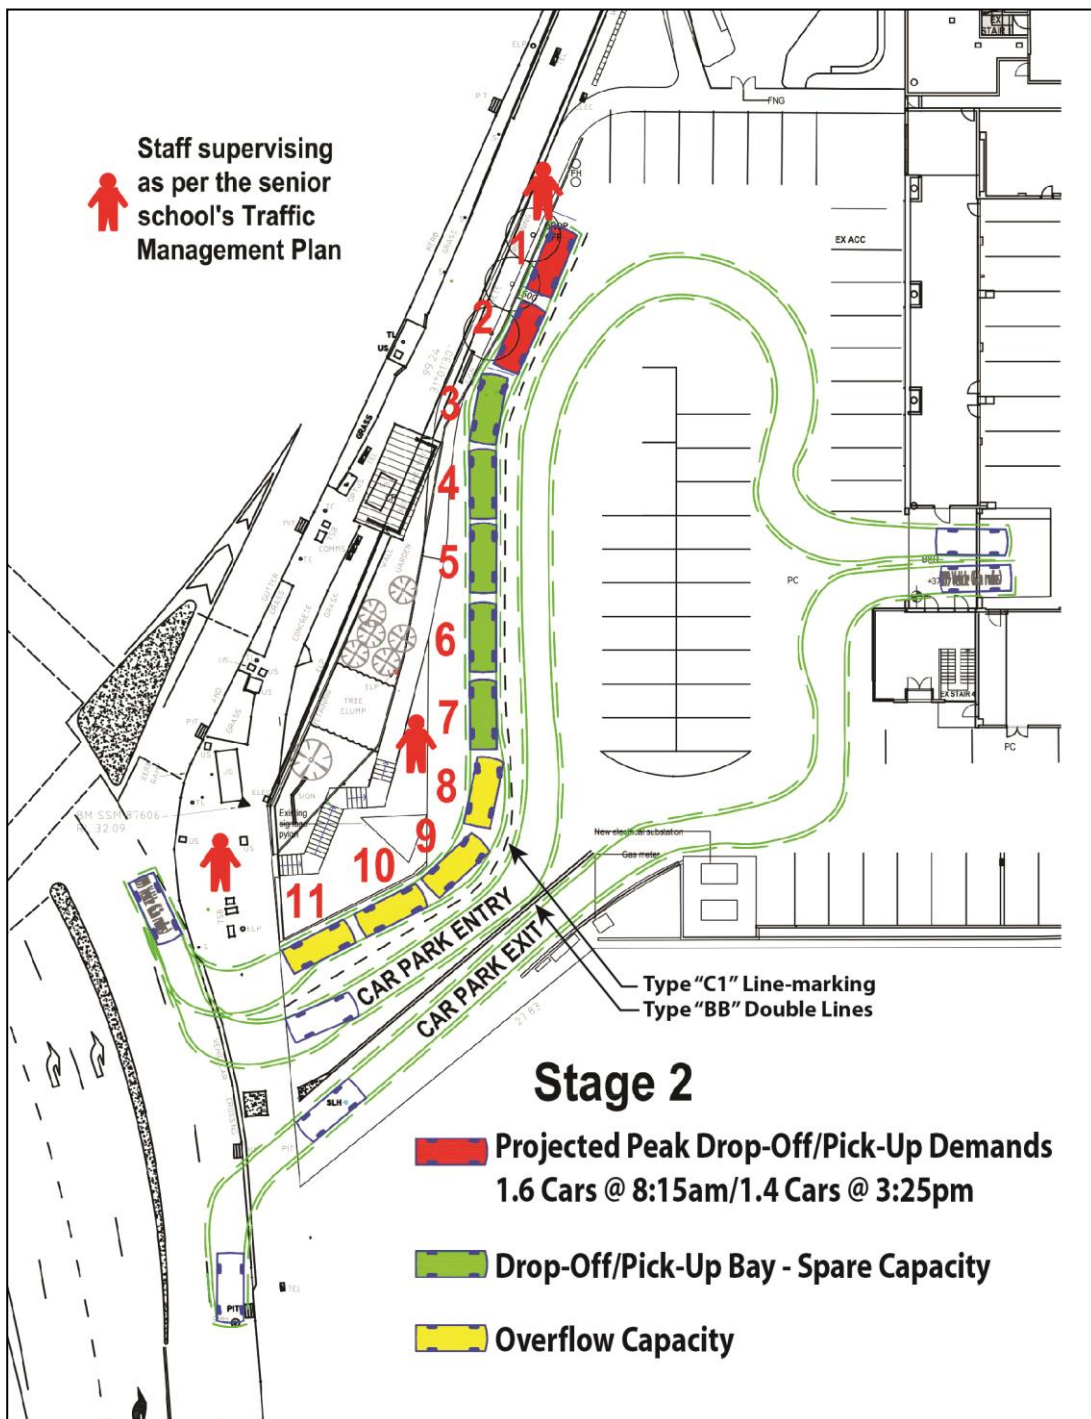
Proposed Stage 2 *Senior School* Drop-Off/Pick-Up Bay & Car Park Access
